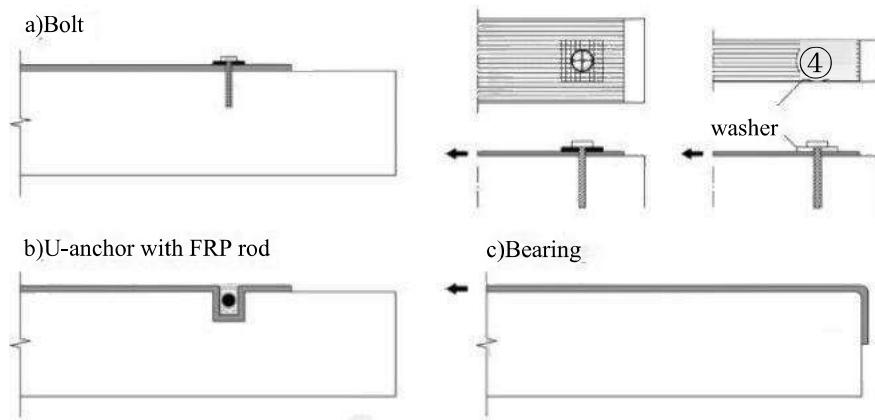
Alternative end anchorage solutions for flexural reinforcement:(a)bolts,(b)rods inside grooves,(c)anchorage through bearing
